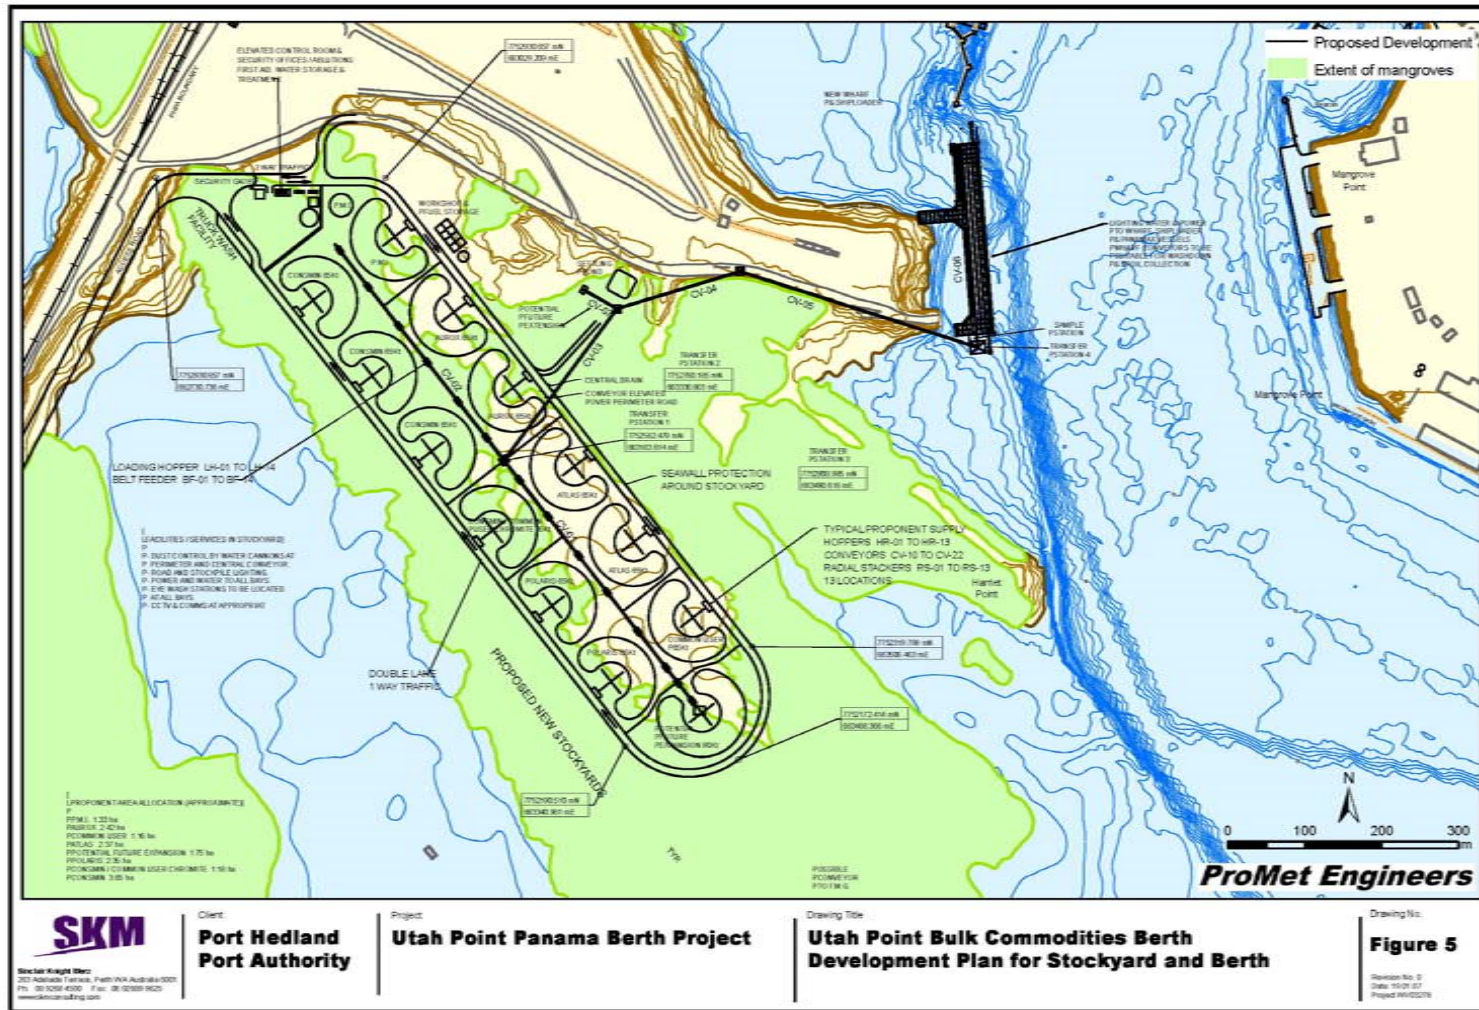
Design Plan of Stockpiles and Berth for the Utah Point Berth Project (awaiting update)
